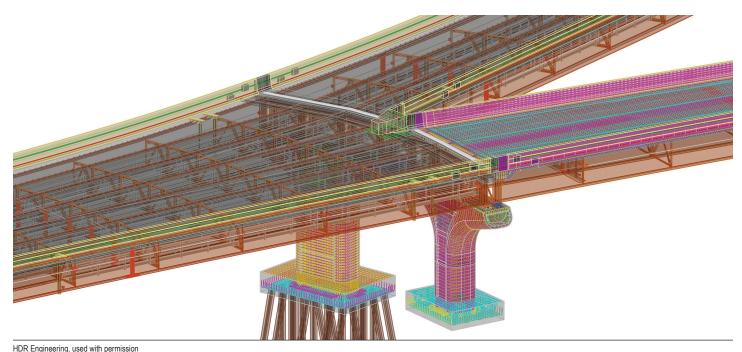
Detailed BIM model for Ramp B developed using OpenBridge Modeler™ and ProStructures™
